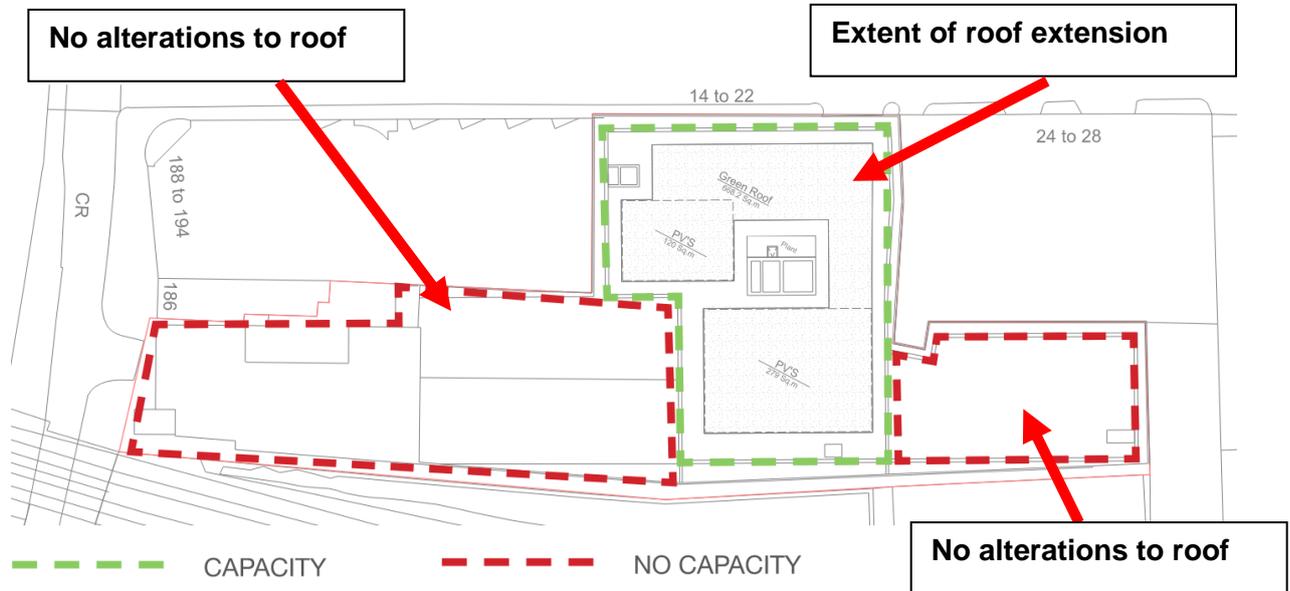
The extent of the proposed roof extension and the building’s structural capacity
